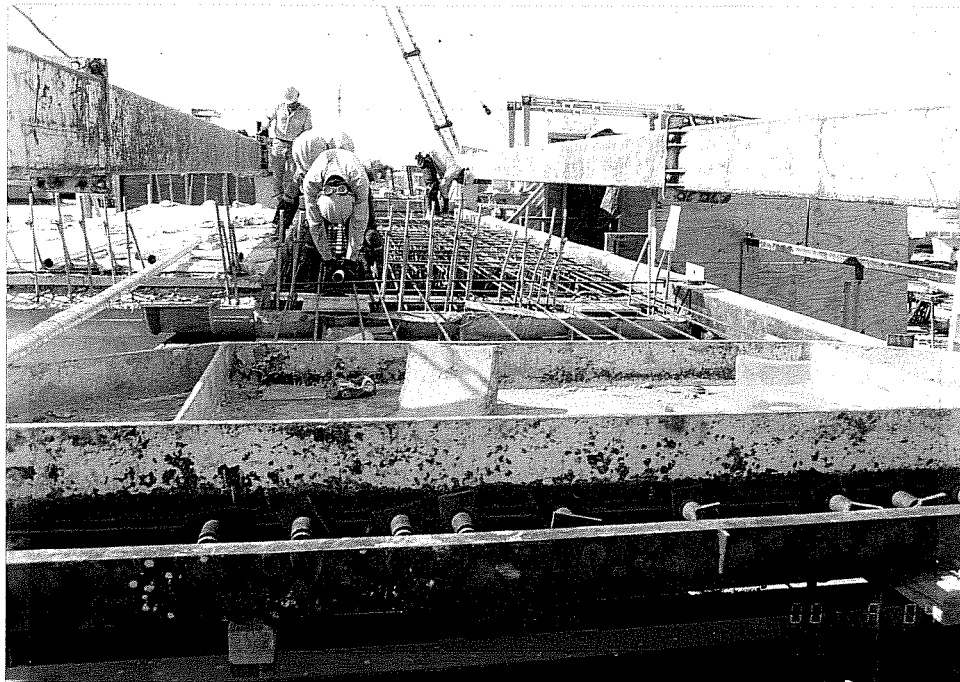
Final installation of prestressing steel ducts in short line casting bed.
